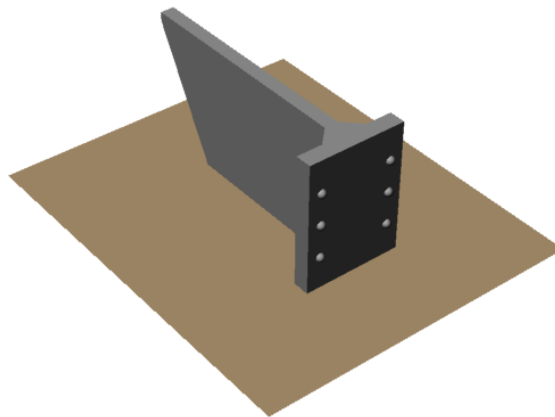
Casting, Storage and Shipping Position of Wing Wall Elements
